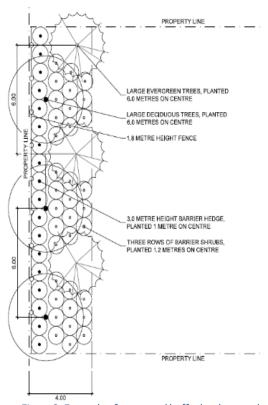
Example of vegetated buffer landscape plan for 4 m width, adjust plantings to accommodate 6 m or 8 m vegetated buffer width.
